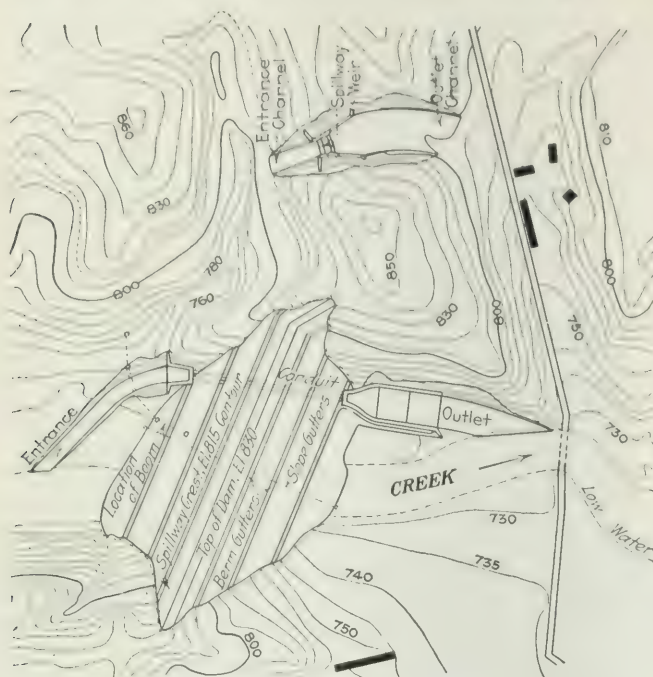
PLAN OF GERMANTOWN DAM, SHOWING SEPARATE SPILLWAY
